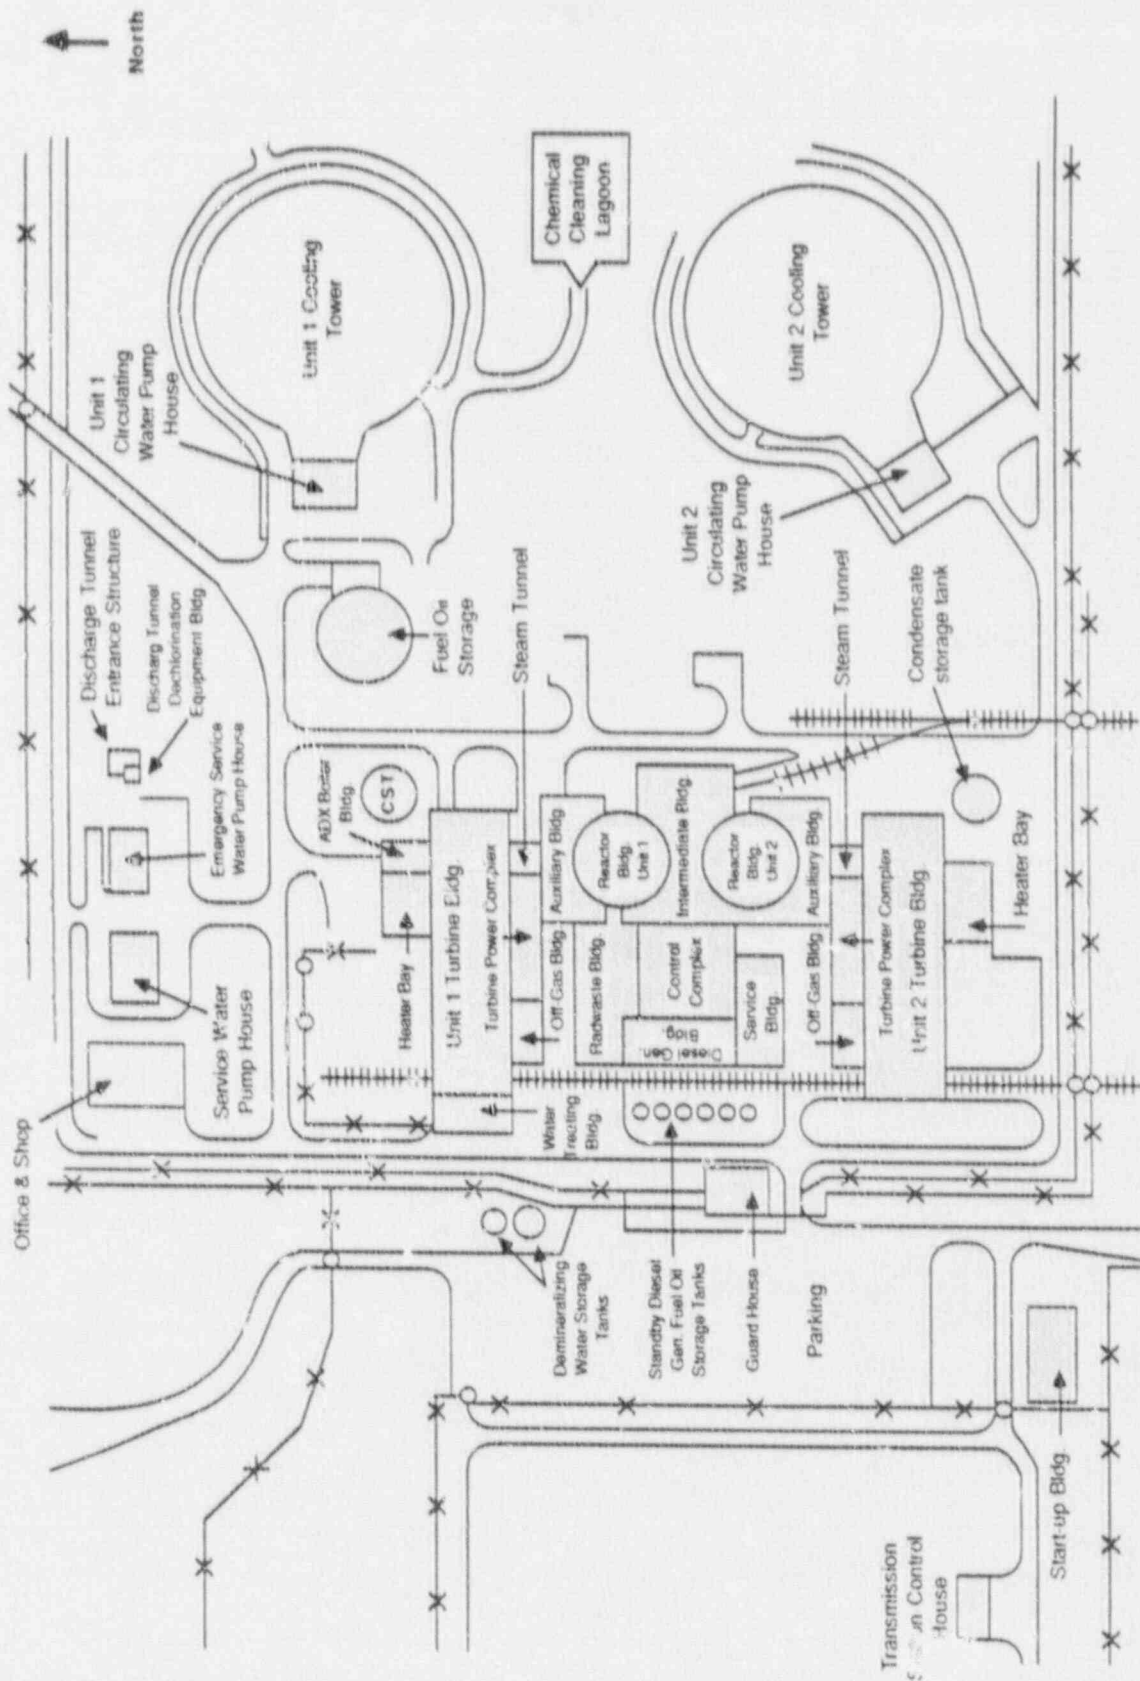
Perry 1 and 2 Simplified Site Plan
